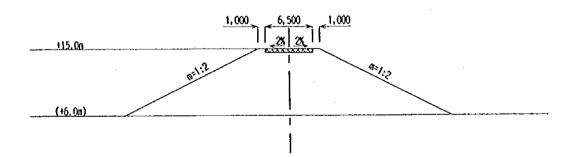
Standard cross section of surrounding embankment with road
